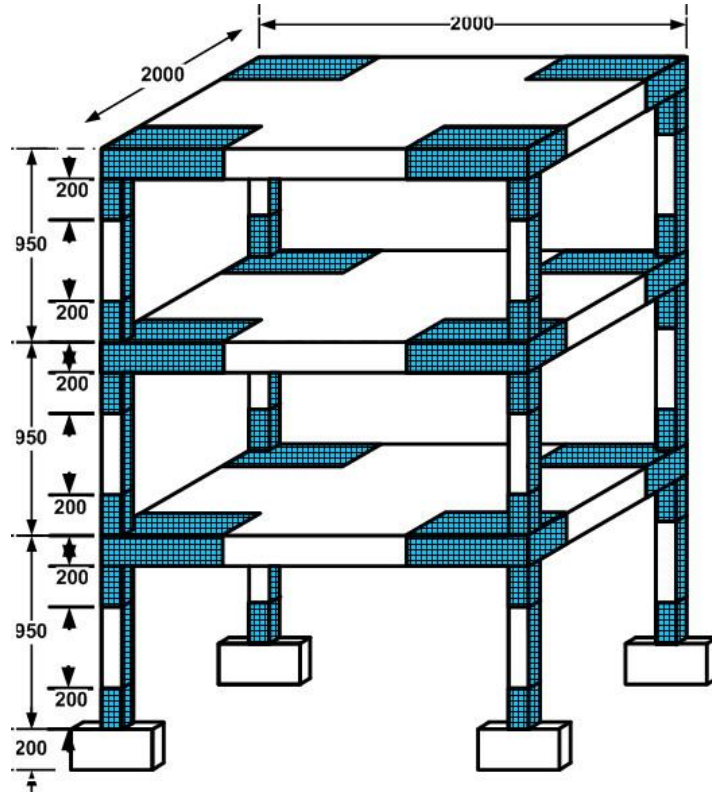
Schematic drawing of the strengthening frame. All dimensions in millimeters.
